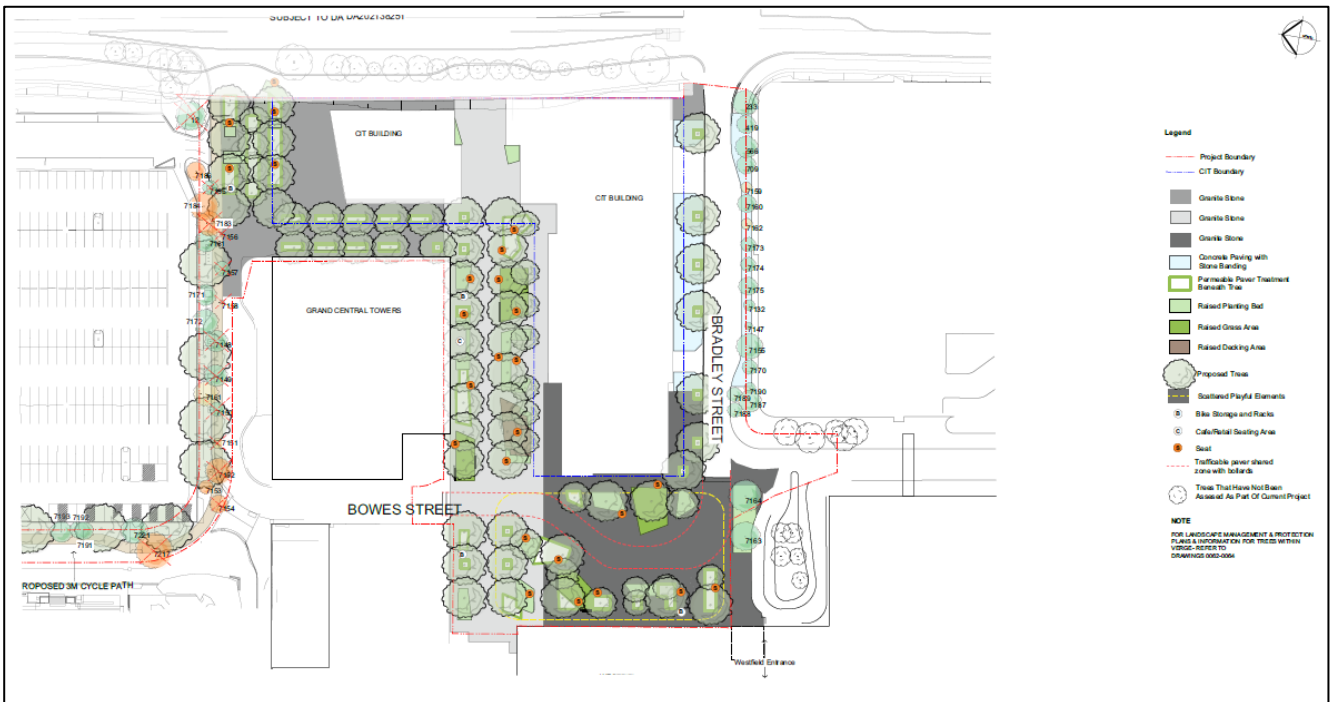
Layout of Bowes Street and Bradley Street future connection (Source: Arup 2020)
